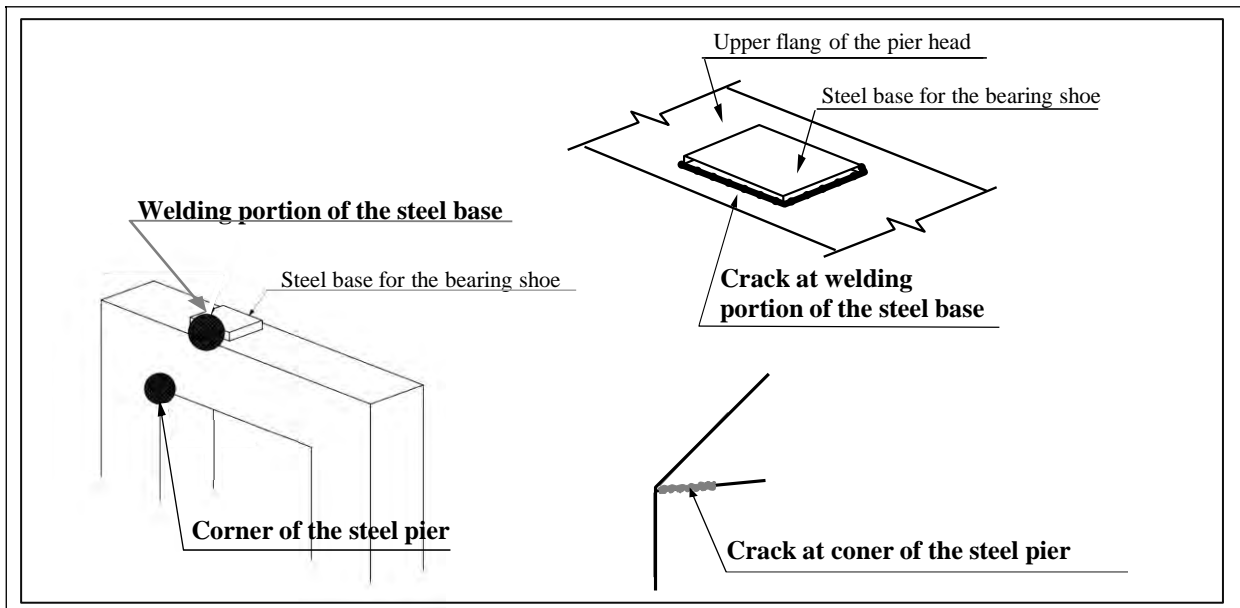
Crack at the Rigid-frame Piers
